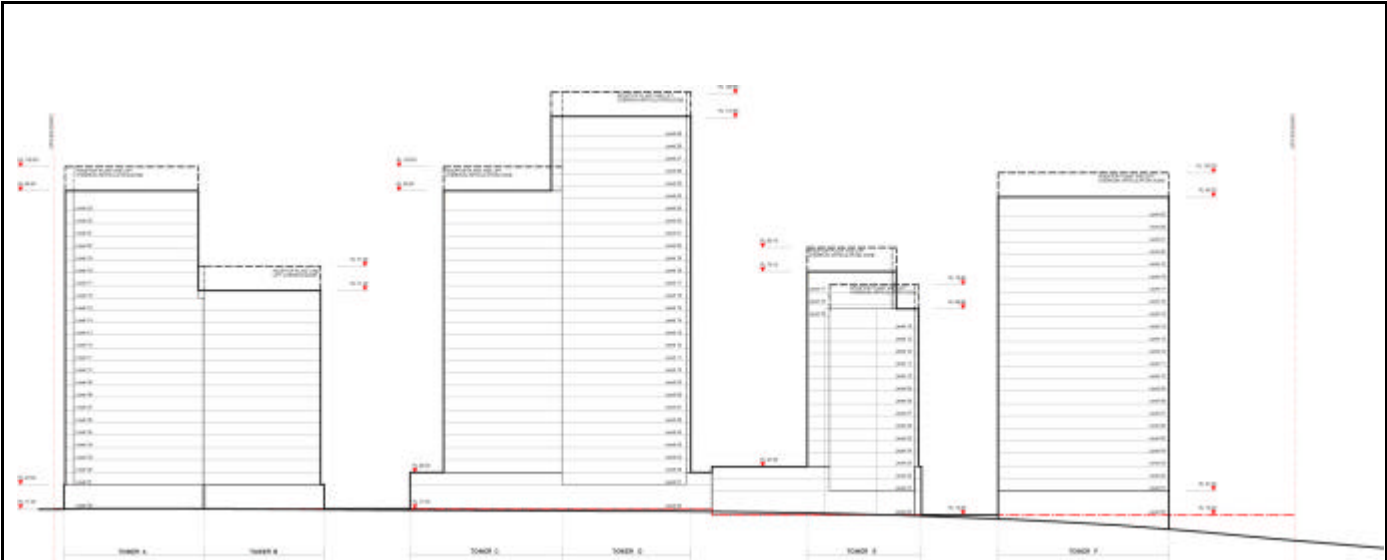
Staged Master Plan DA 246-10-2004 building envelopes Section
